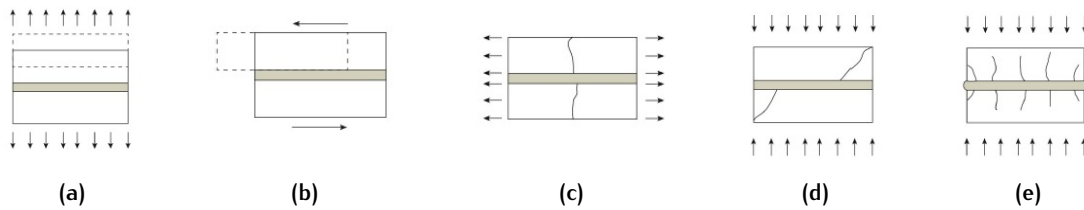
Local failure mechanisms: (a) Joint tension cracking; (b) joint slipping; (c) Unit direct tension cracking; (d) Unit diagonal tension cracking; (e) masonry crushing.
